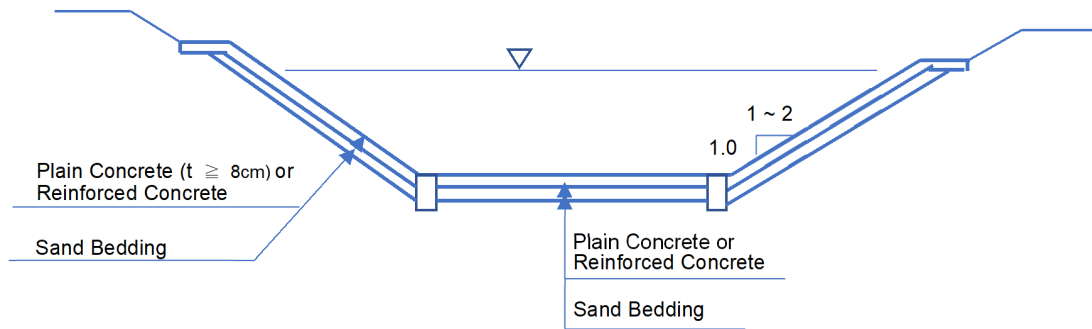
Typical Cross-Section of Concrete Lining Canal
